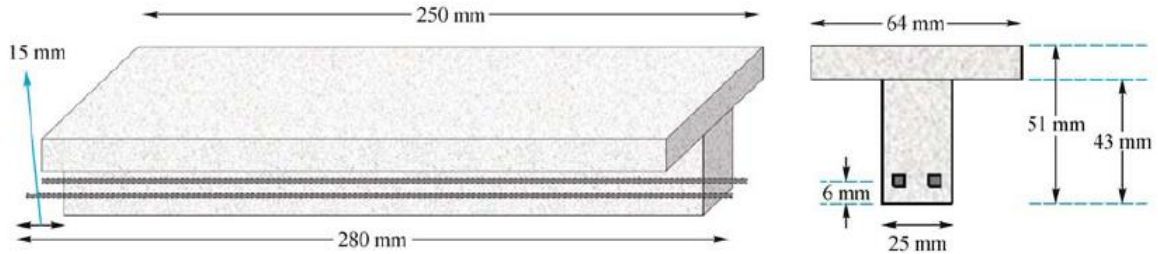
Cross sectional dimensions of T-beam tested (Zafar and Andrawes, 2013)
